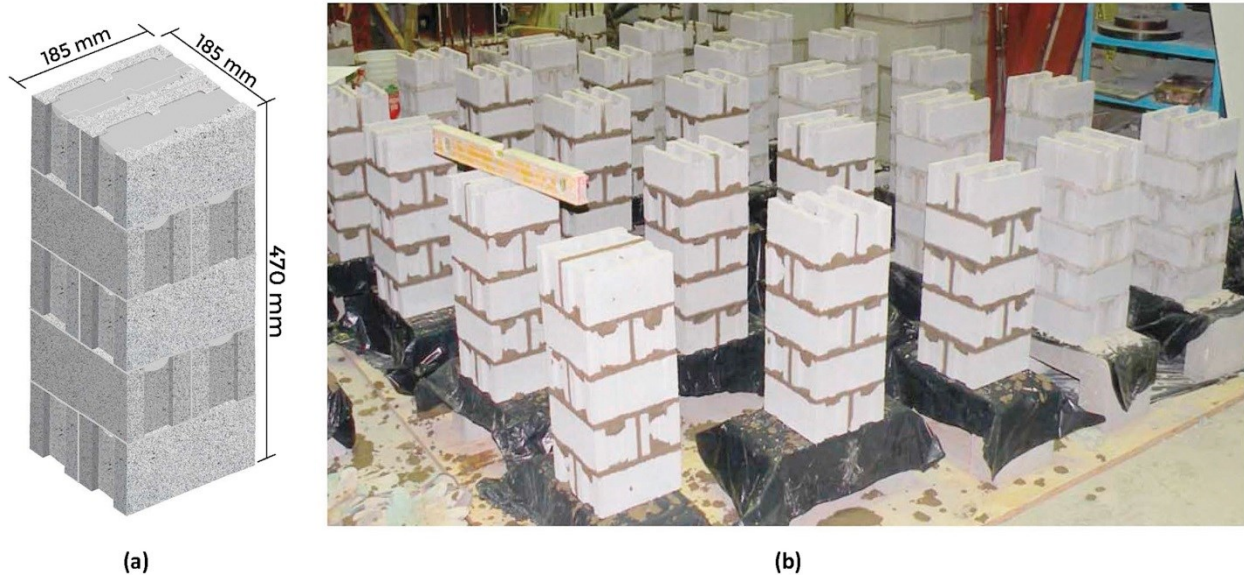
(a) Dimensions of half-scale fully grouted prism; (b) prisms construction before grouting.
